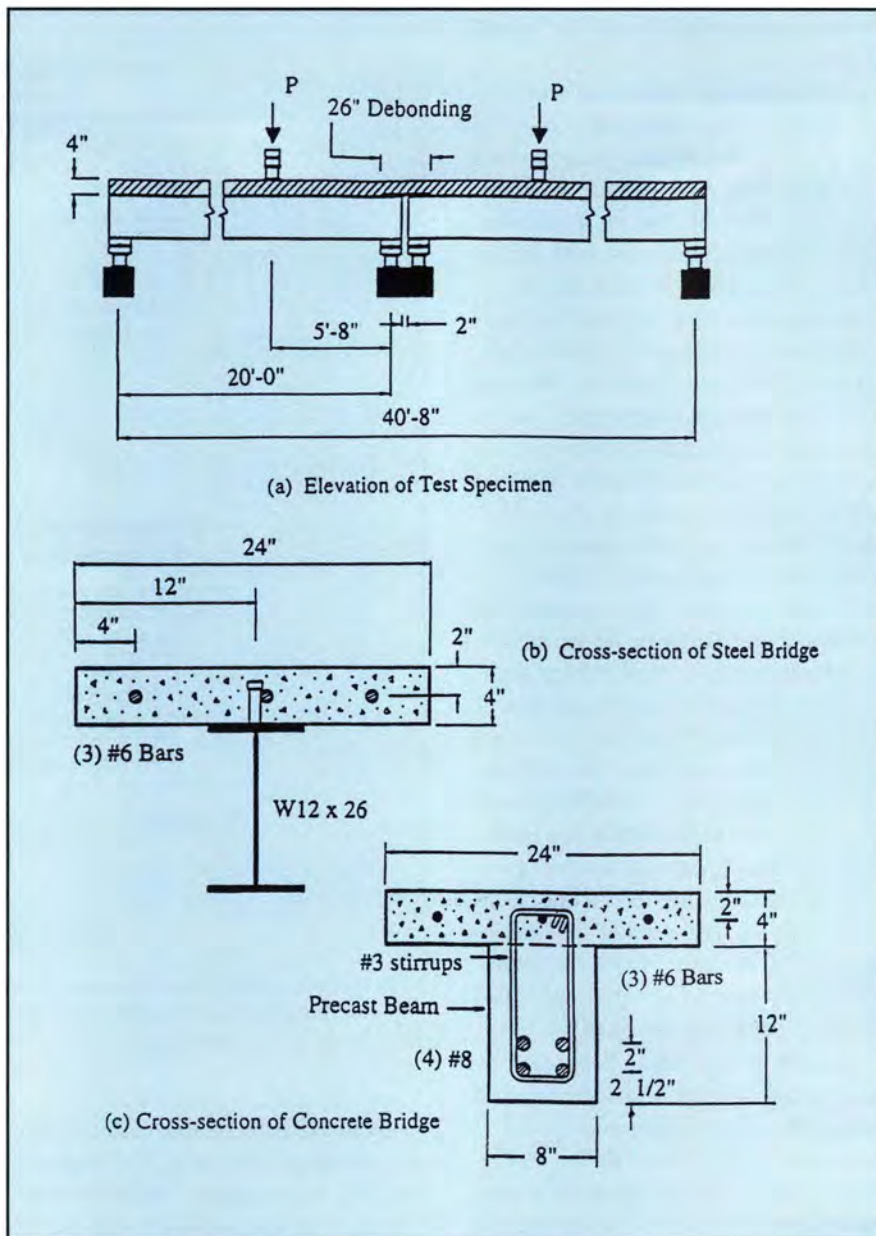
Details of test specimens. Note: 1 in. = 25.4 mm.
